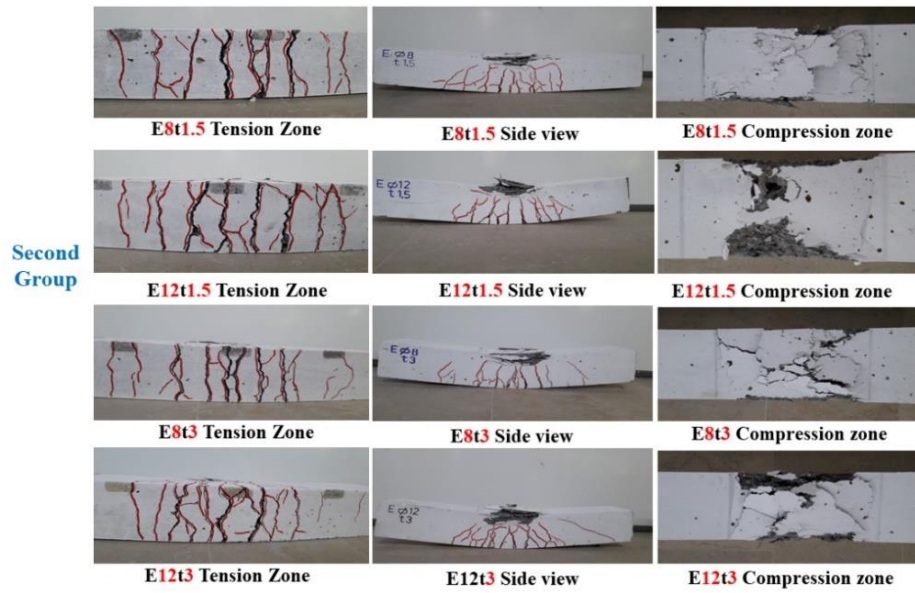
Patterns of the failures in the concrete beams (second group)
